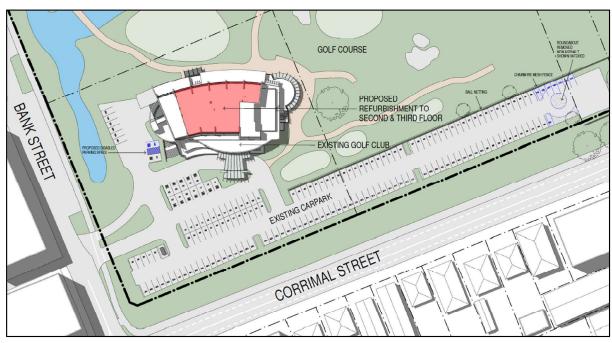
SITE PLAN AND DESCRIPTION OF WORKS (MORSON GROUP)
